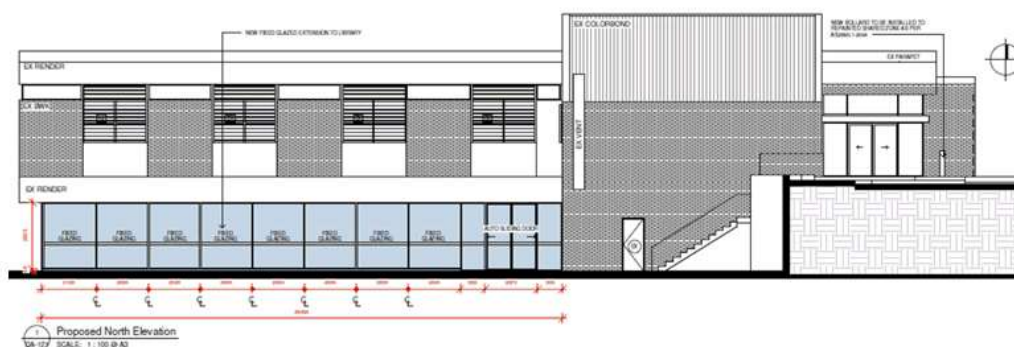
Elevation plan showing proposed alterations and additions (enclosure of existing ground floor verandah area with fixed glazing and new entry doors)
